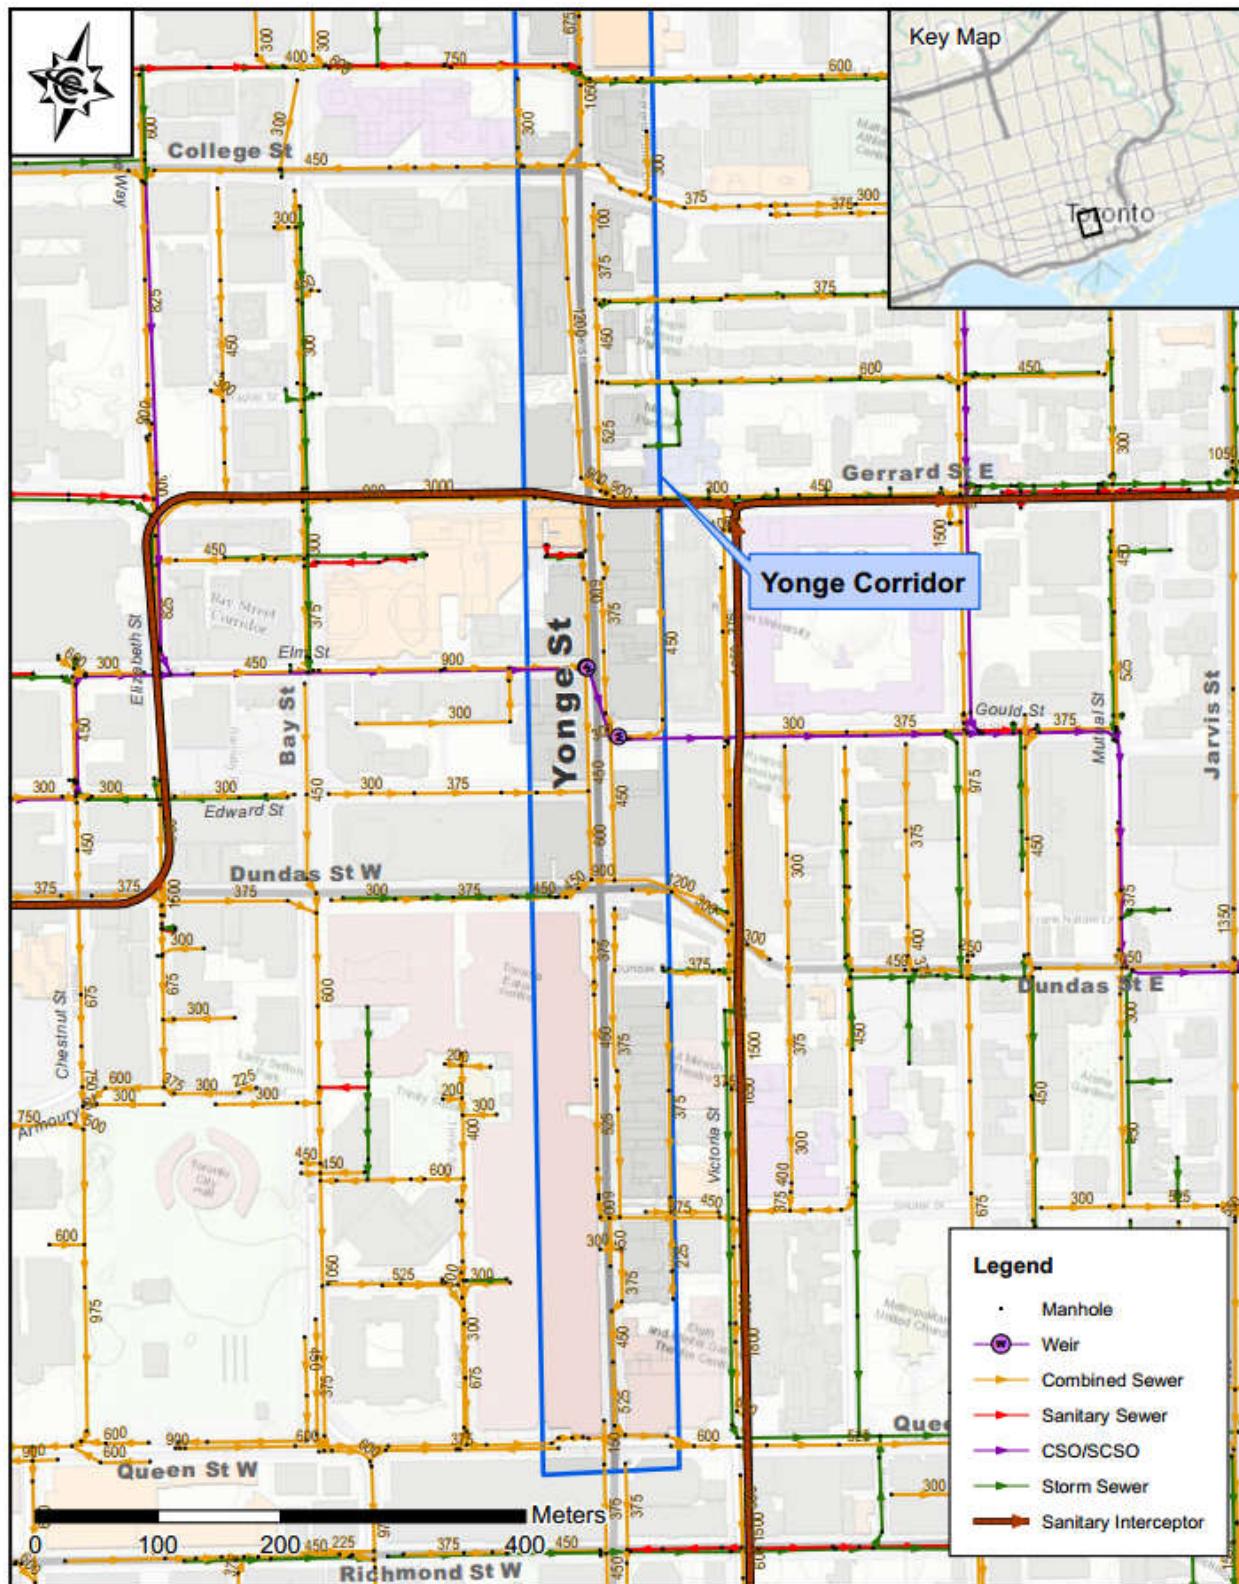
Yonge Corridor Existing Sewer Servicing
